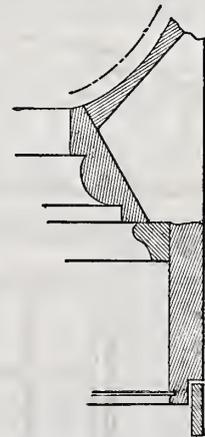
Section through Molding Over First Story Windows.—Scale, $1\frac{1}{2}$ Inches to the Foot.
